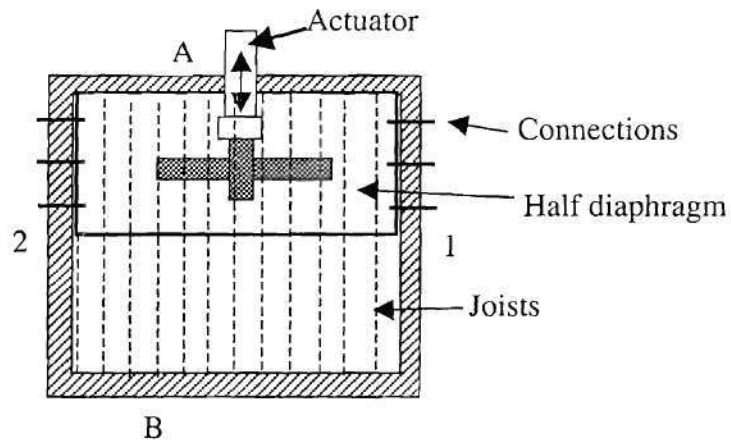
Testing of half the roof diaphragm parallel to the joists
